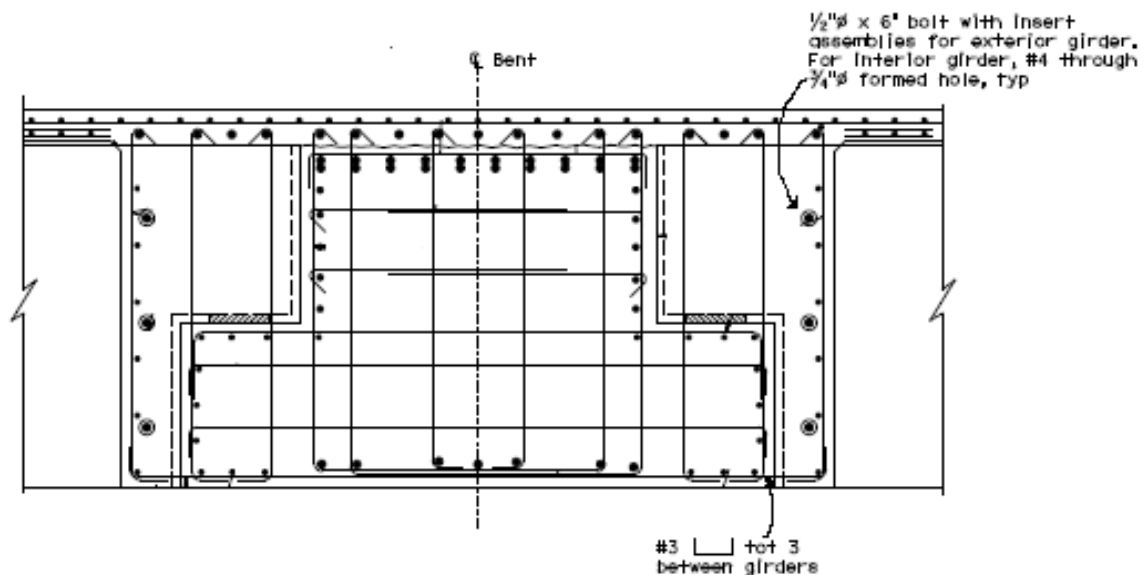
Connection details of reinforcing bars connecting the girders to the diaphragm and cap beam
